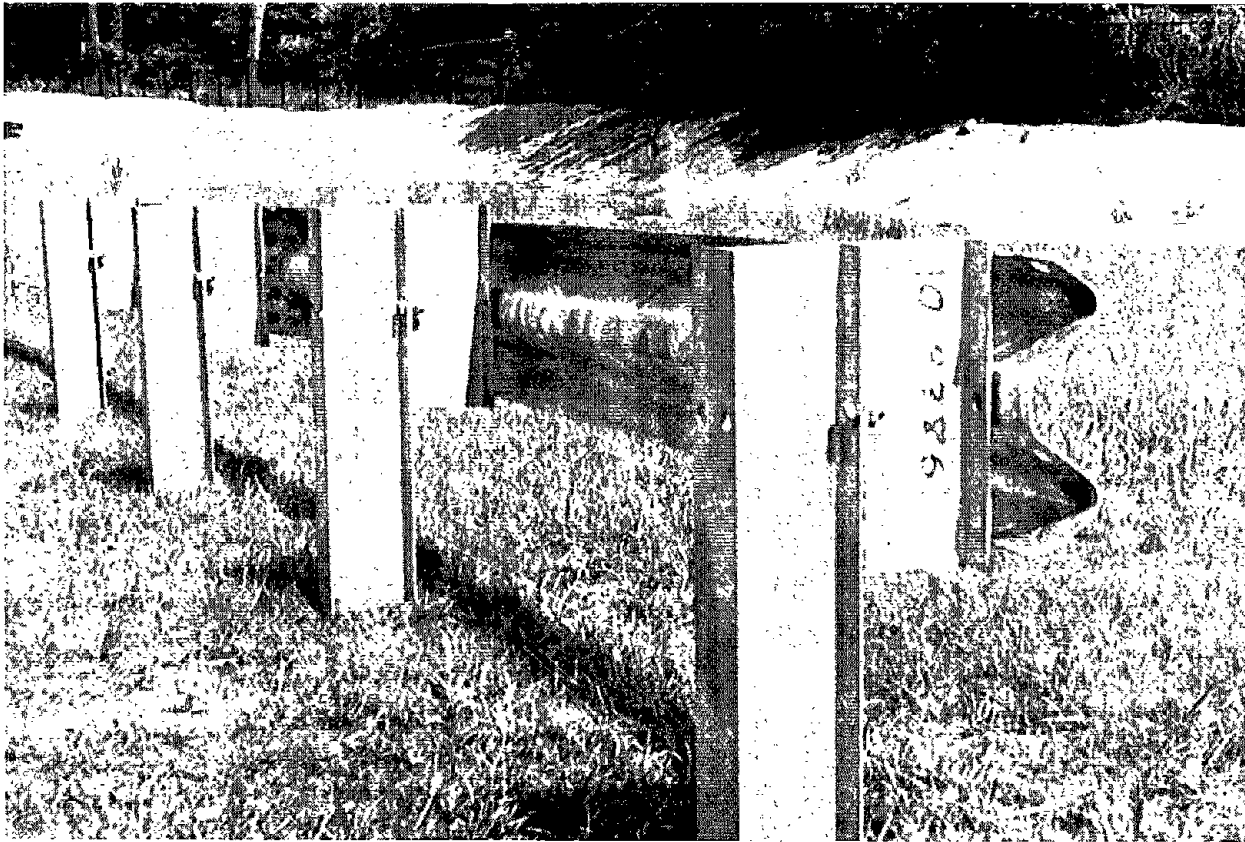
Photograph of AASHTO M-183M steel guardrail posts supporting W-beam guardrail.
